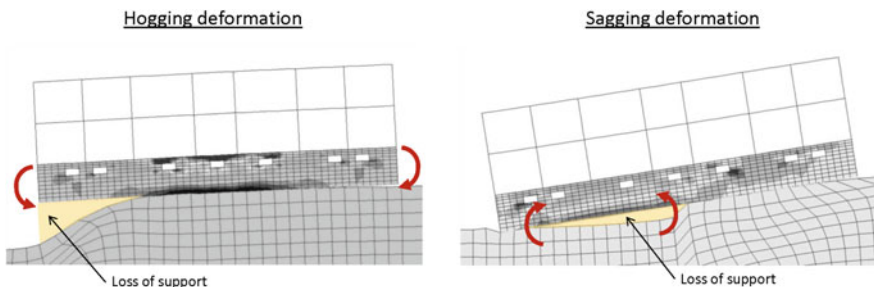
Typical observed behavior for structures founded on a foundation slab subjected to dip-slip faulting. Depending on the location of the fault rupture, the foundation structure system may be subjected to either hogging (left) or sagging (right) deformation
